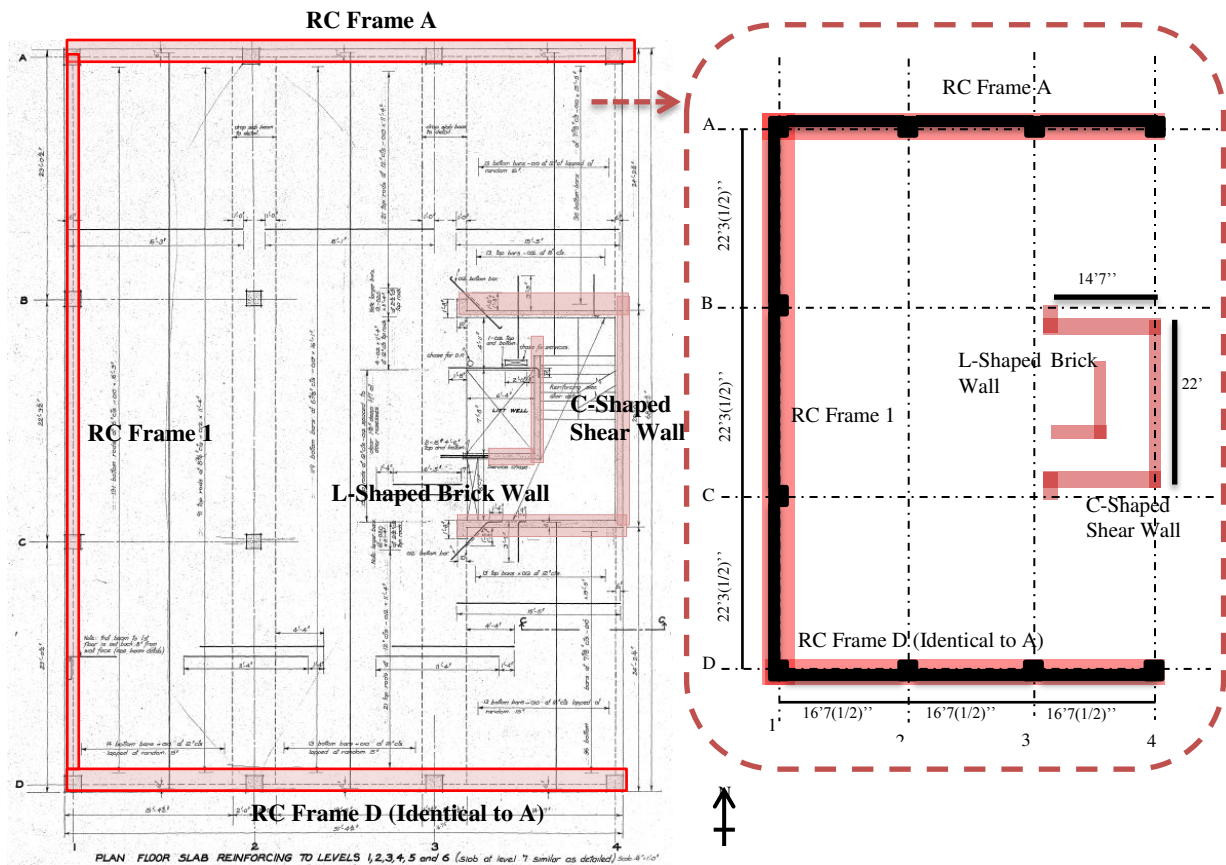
2: Ground floor plan view of Building No.21 Securities House with illustration of structural systems
